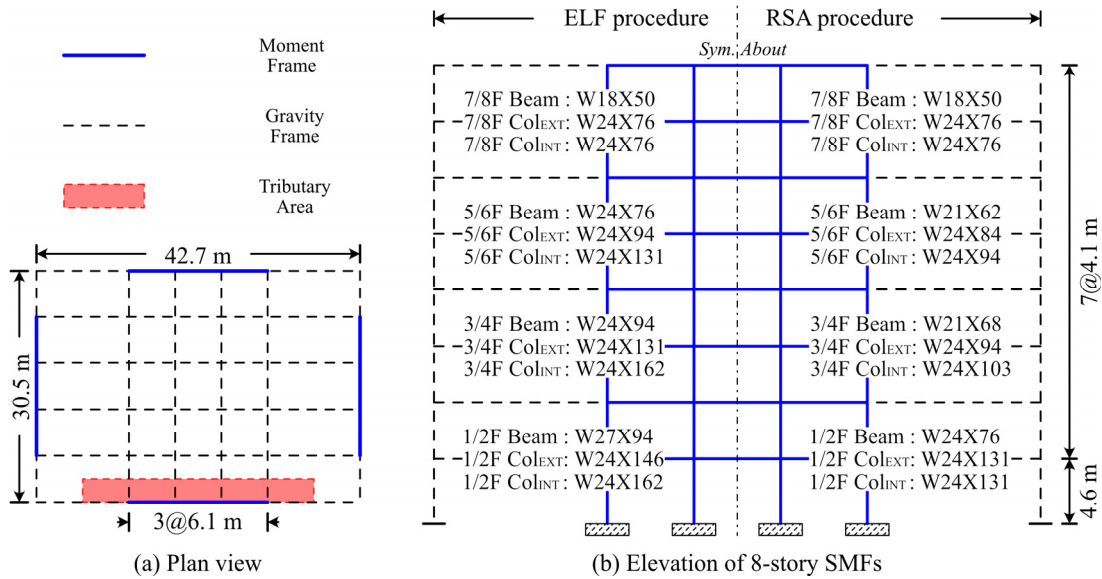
Plan and elevation with designed section using ELF and RSA procedure
